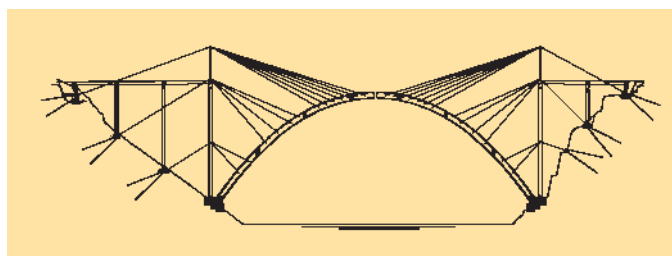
Cross-sections of the bridge over the Pazinčica abyss
